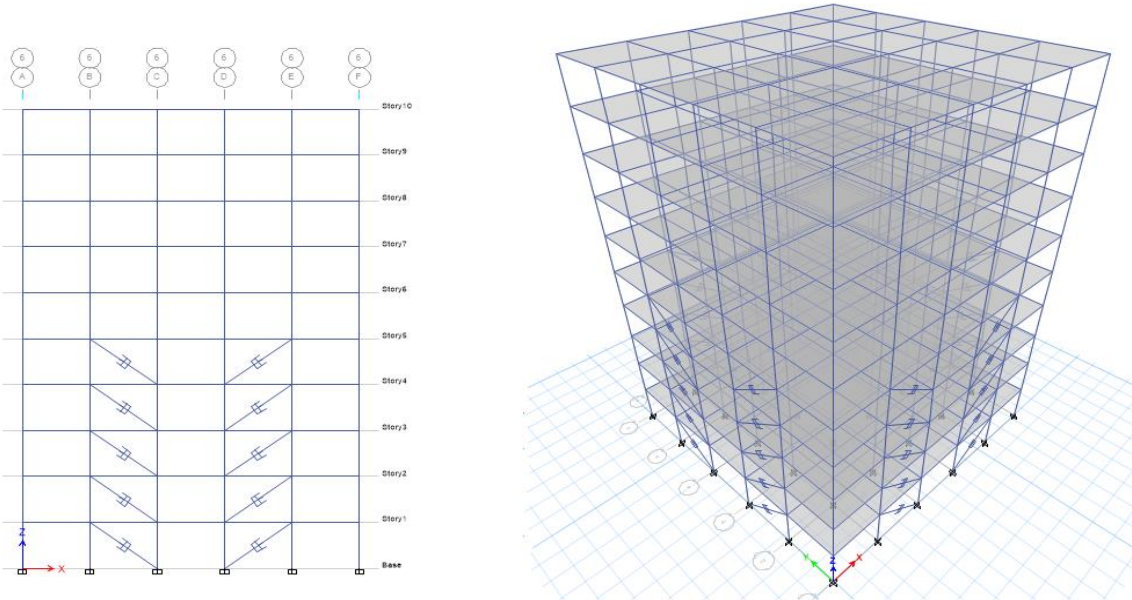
RC bare frame, dampers at Intermediate Bay, in bottom half storeys (BDIBH)
